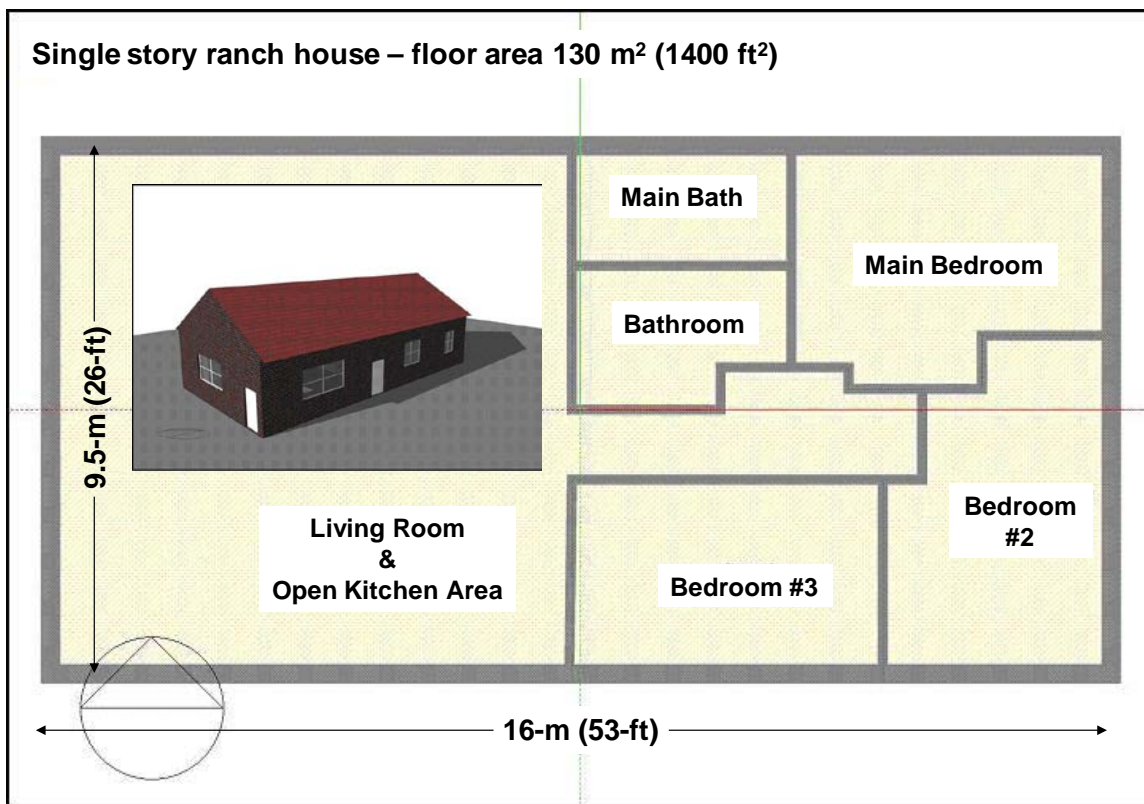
Floor plan of the one-story ranch house used in whole house energy simulations.
